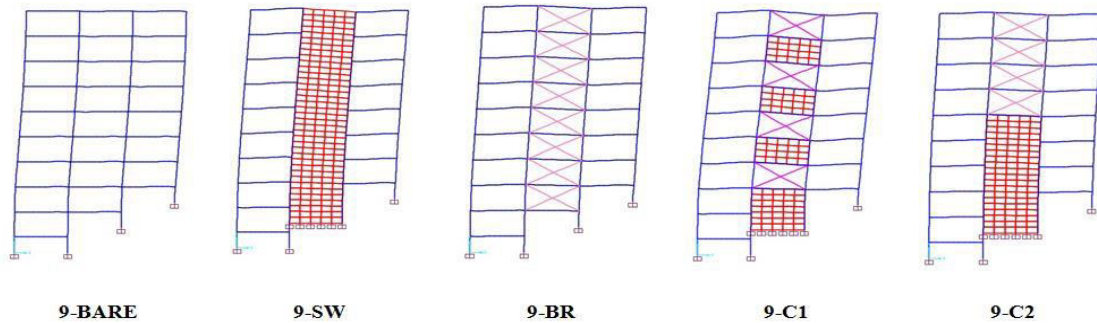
Deformed shapes of 9 storey models with bare frame(9-BARE), shear wall (9-SW), bracings(9-BR), combination 1(9-C1) & combination 2(9-C2)
